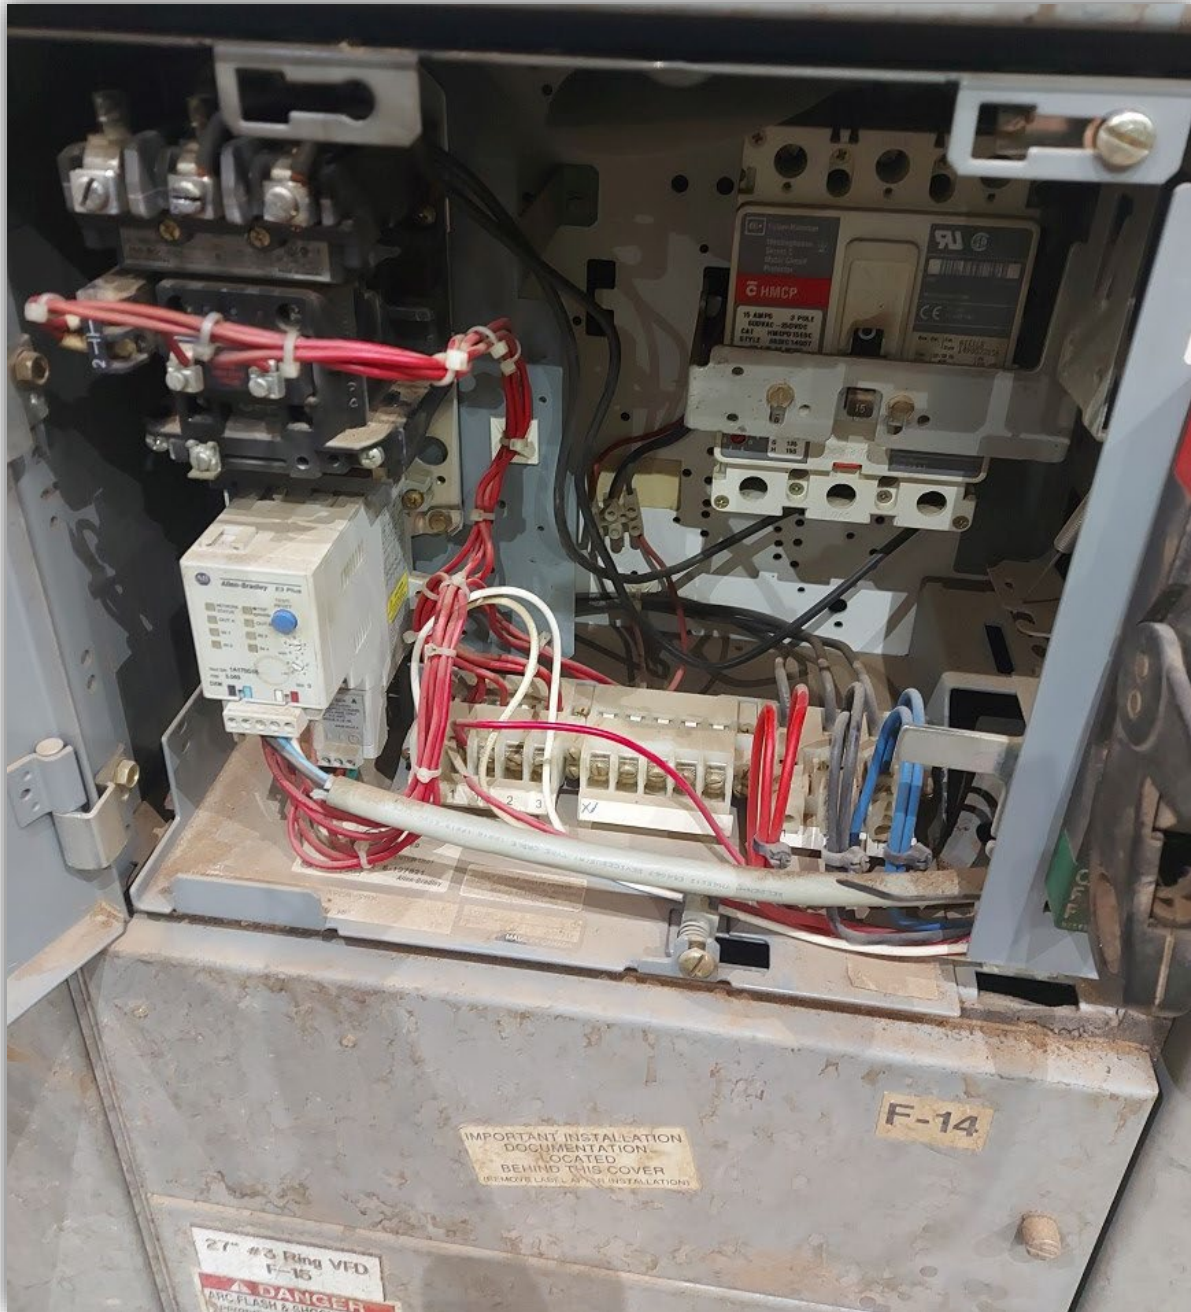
Inside Motor Control Centre (MCC) Bucket the phase "A" TEW conductor has been removed. If the picture is enlarged, you can see the starter mounting plate.
